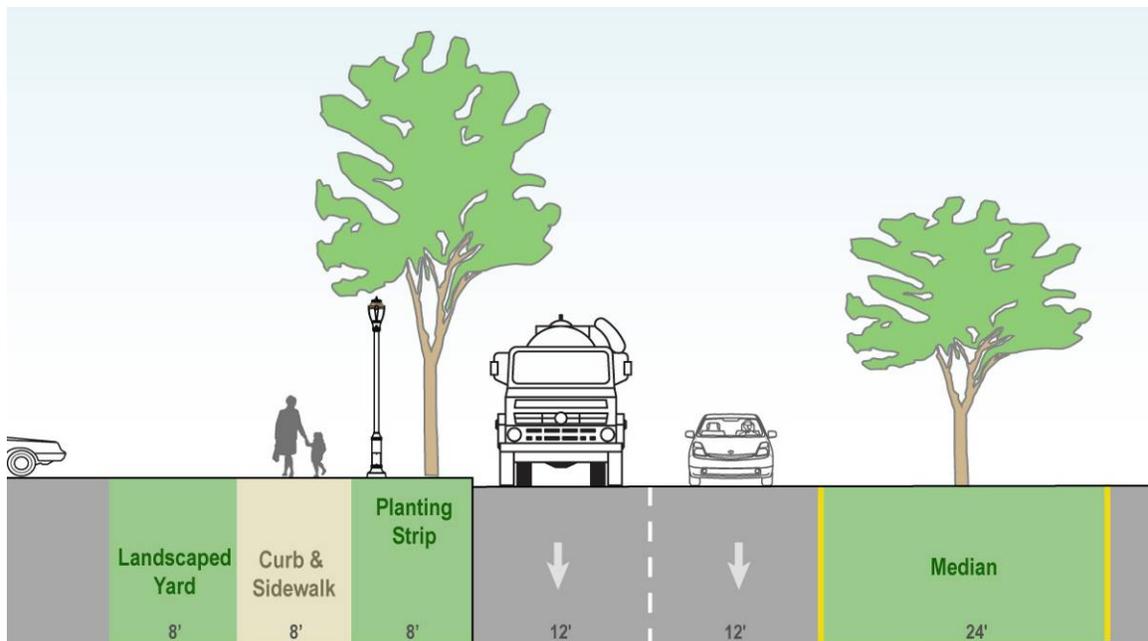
Alternative cross section of Eastern Boulevard with planting strip and sidewalk
